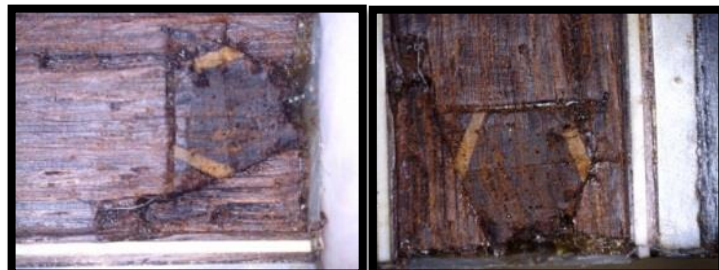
Dovetail joints and small pieces of wood used to tighten the connection
